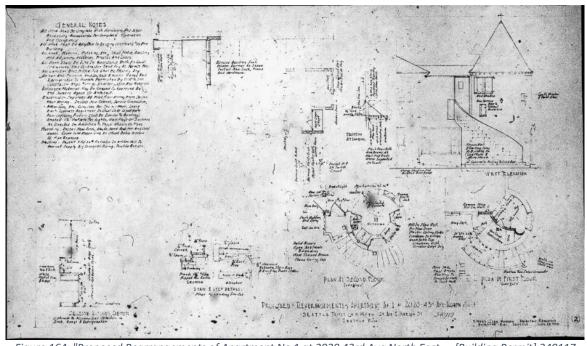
"Proposed Rearrangements of Apartment No 1 at 2020 43rd Ave North East ... [Building Permit] 340117 Emory Glen Morgan Architect & Engineer [...] June 26 1940"
